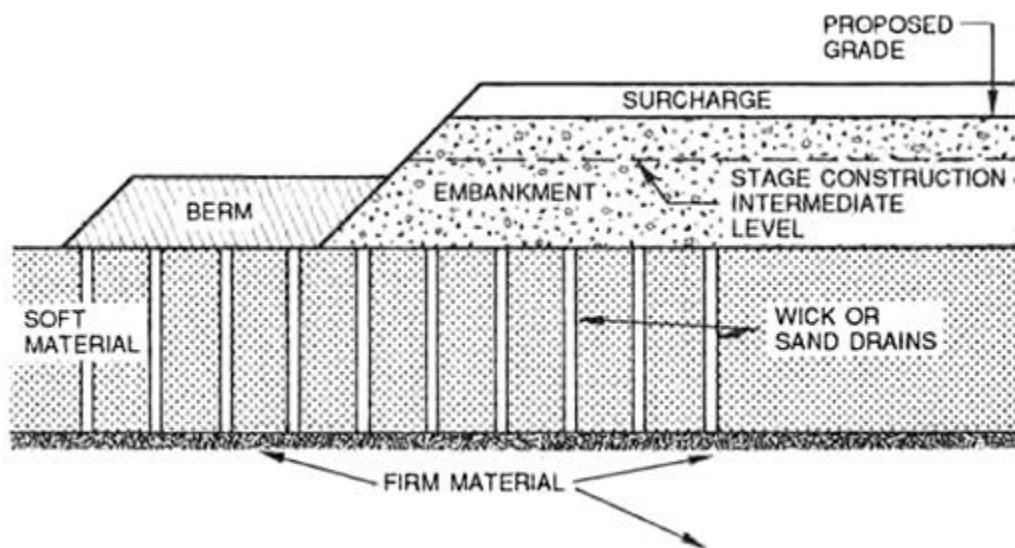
Stabilization by consolidation with a surcharge fill and wick or sand drains (Ariema and Butler 1990).
